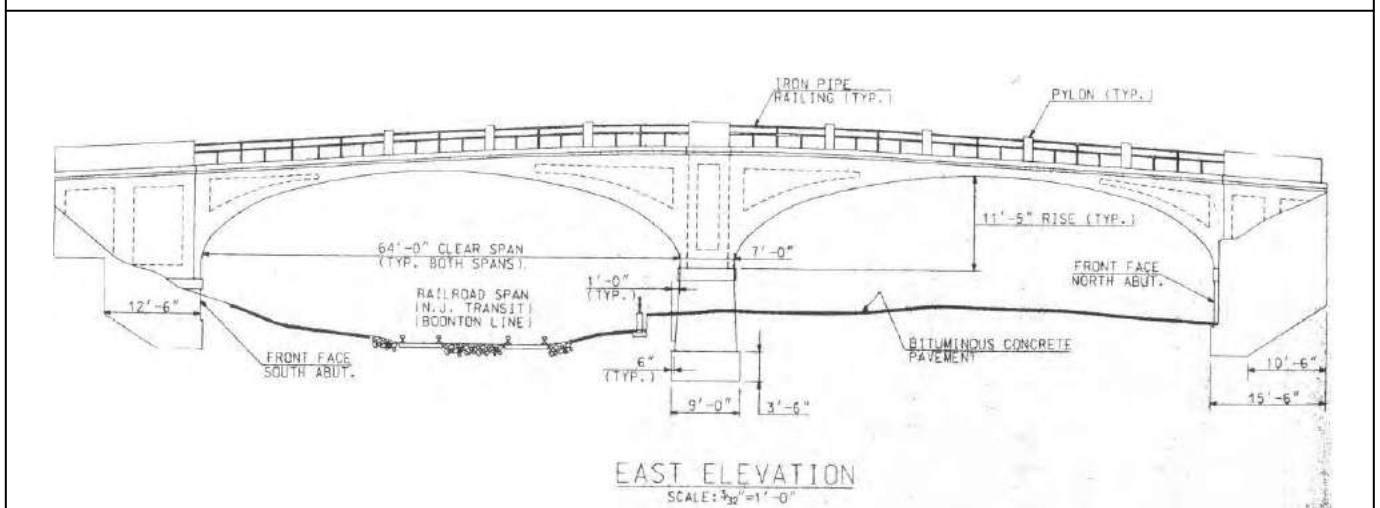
General Elevation of the Existing Landing Road Bridge
